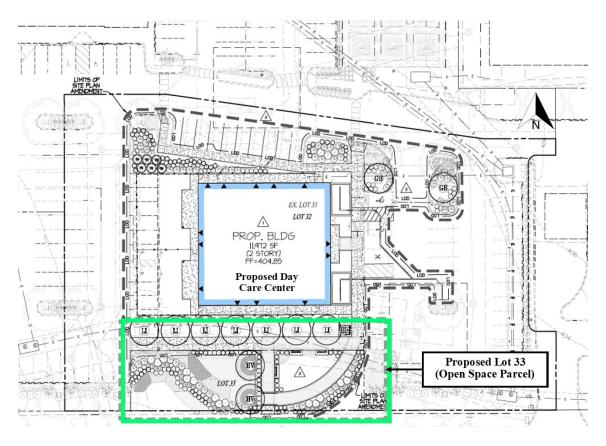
Proposed Open Space (Lot 33) & Landscaping Plan
